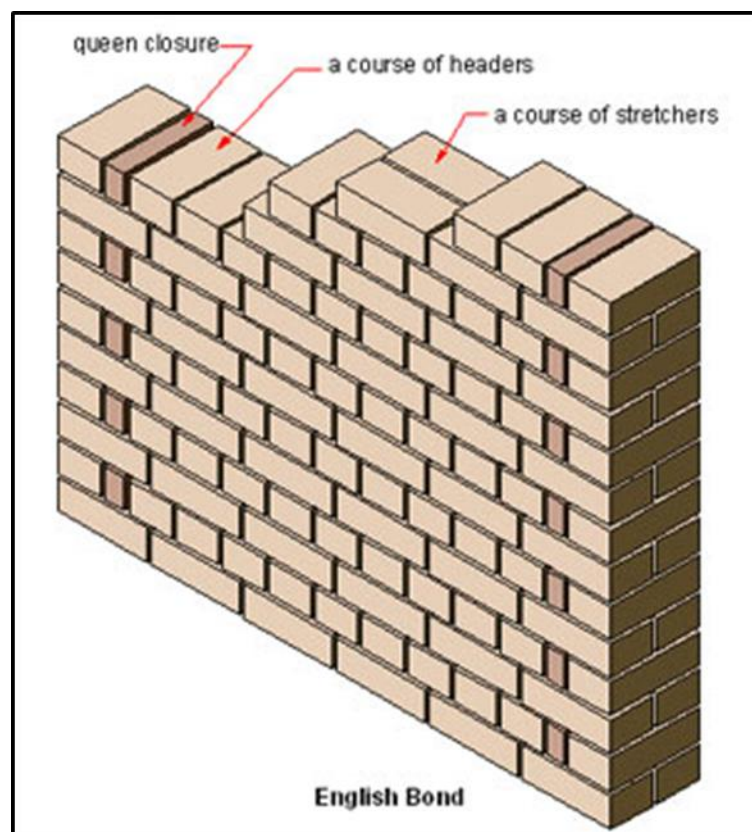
Brick wall structure. [Adopted from (Interior Shapes & Designs 2013).]
